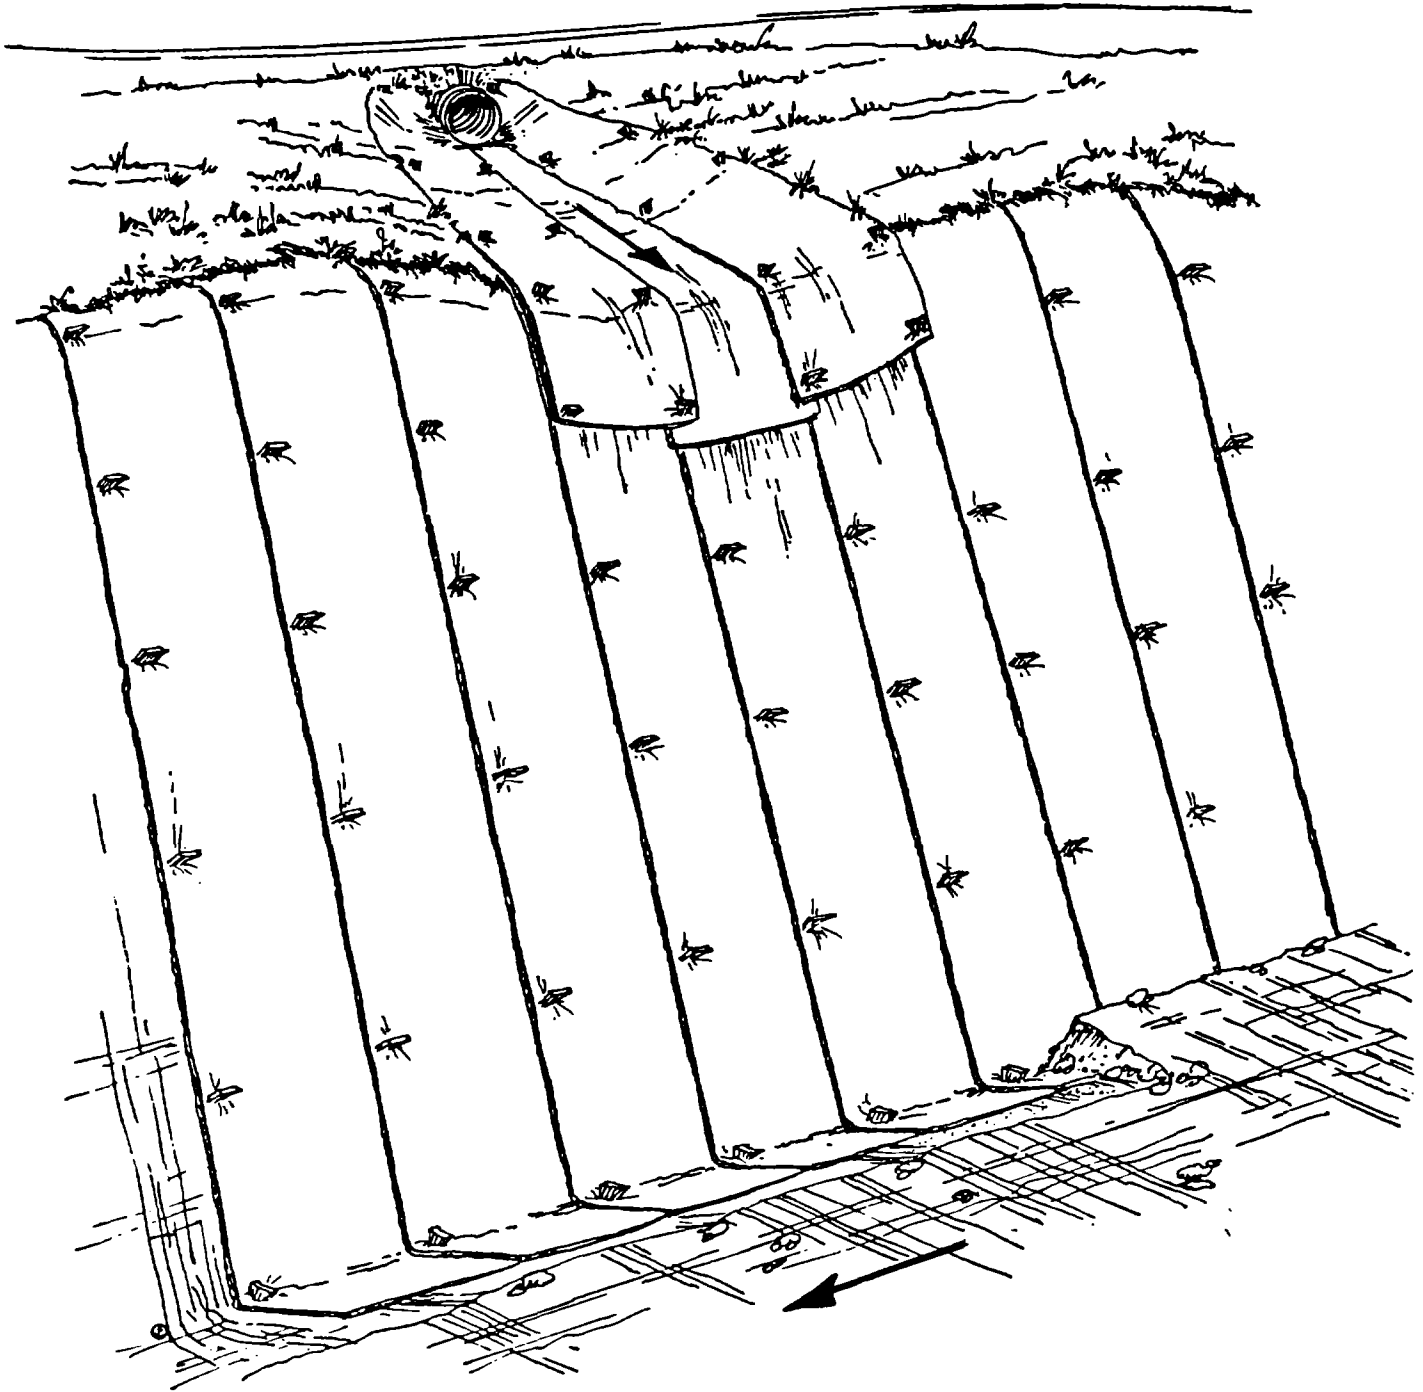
ENKAMAT® BANK LINING - BARE BOTTOM CHANNEL
